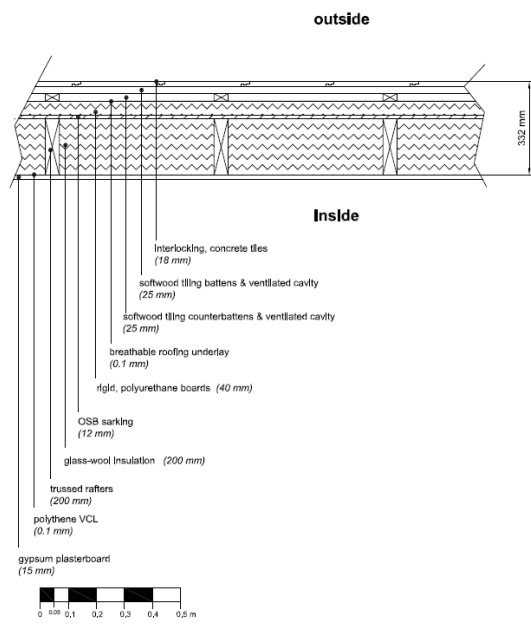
Roof TF (trussed rafters), cross-section.
